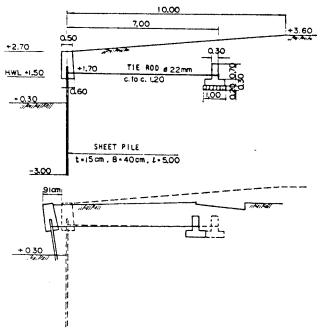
Damaged Quay wall at Hachinoe Port, 1968 Tokachi-Oki Earthquake (After Werner and Hung, 1982)
